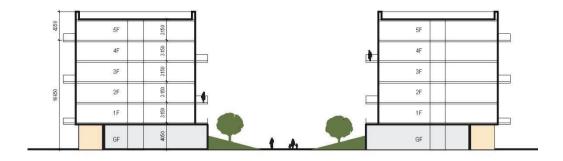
d – Apartment Block Section, Built-Up Landscape
